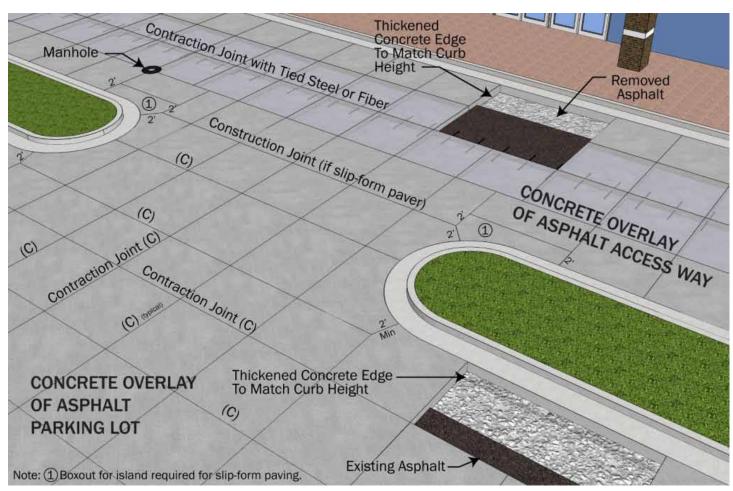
Typical small, square-paneled jointing pattern in concrete overlay of parking lot, access way, and trucking lane
